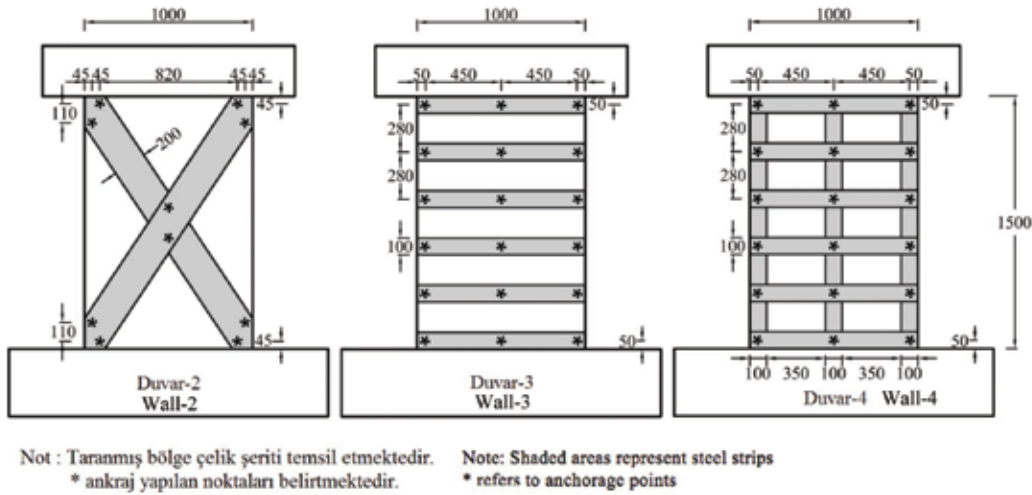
Reinforcement details of test specimens. (Measurements are shown in mm.)
